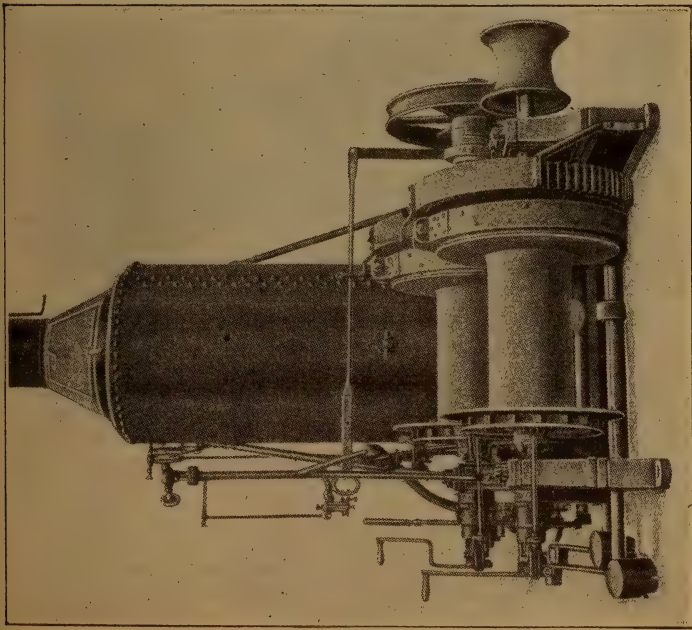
Double Cylinder, Double Friction Drum, Link Engine.
